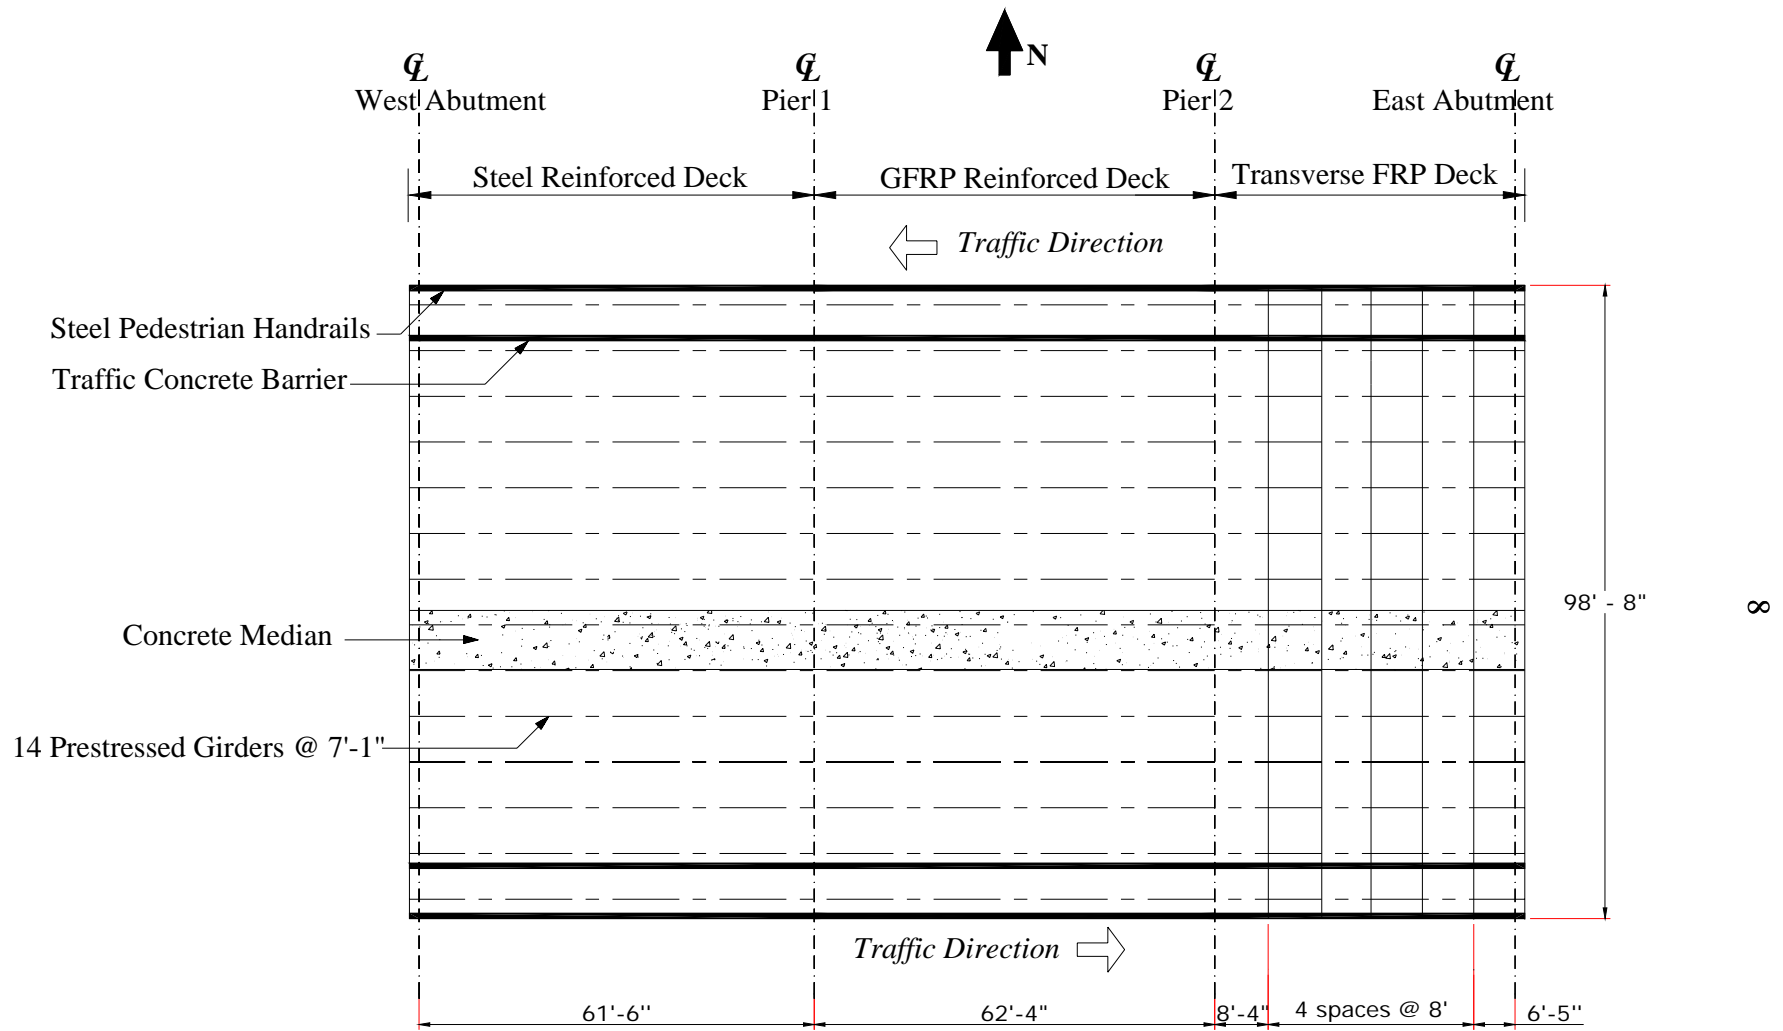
Plan View of the 53rd Avenue Extension Bridge
